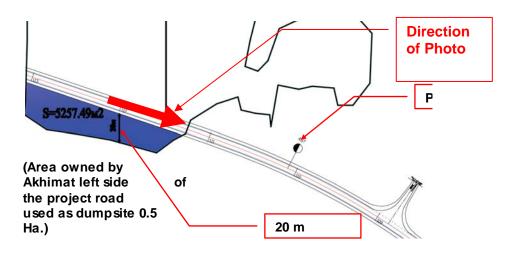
Layout of the Dumpsite with the Photo Project Road (1)
